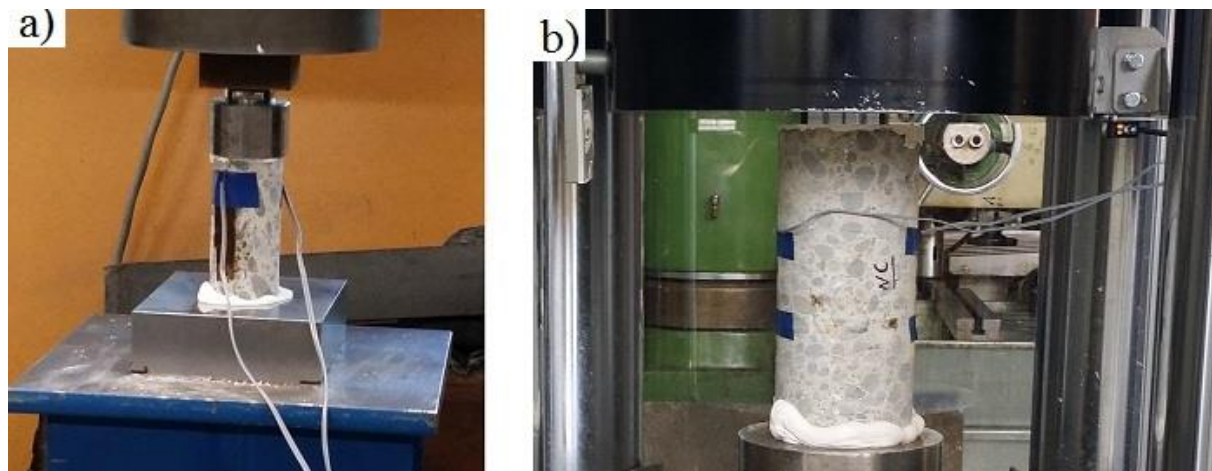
Photos of compressive testing a) 35mm diameter samples; b) 93mm and 100mm diameter samples
